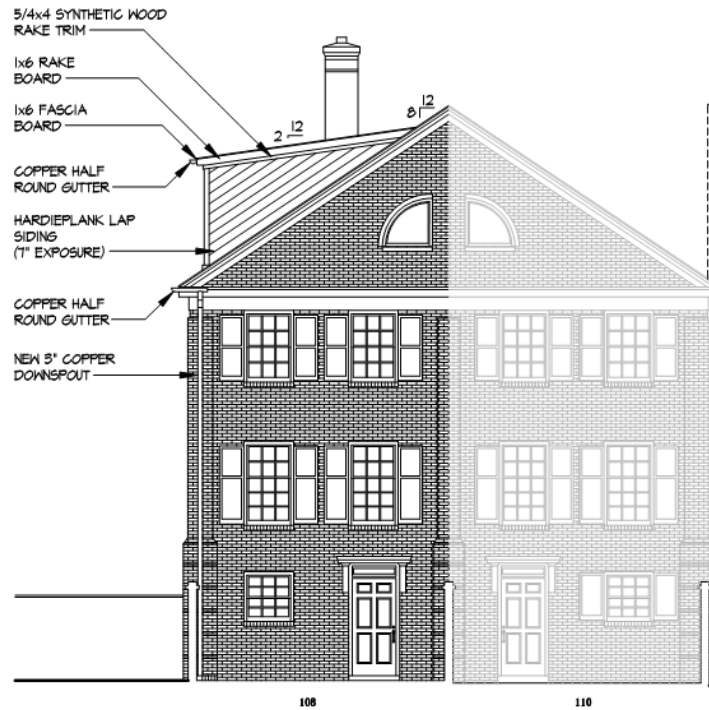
Front/north elevation with the proposed dormer on the eastern townhouse
